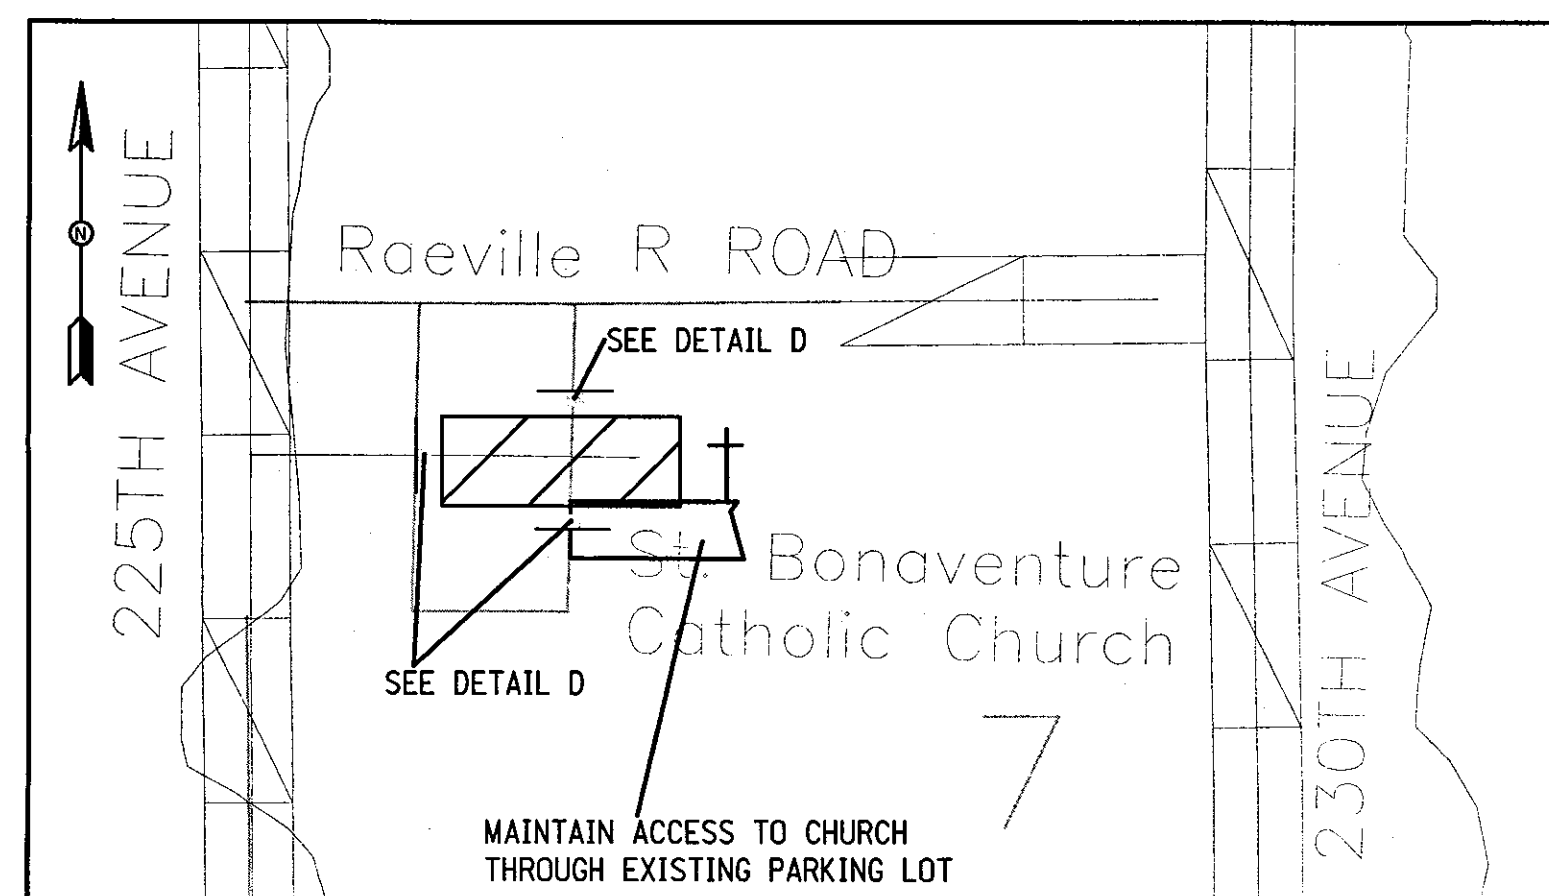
DETAIL C - TYPICAL ROAD CLOSURE BEYOND INTERSECTION
